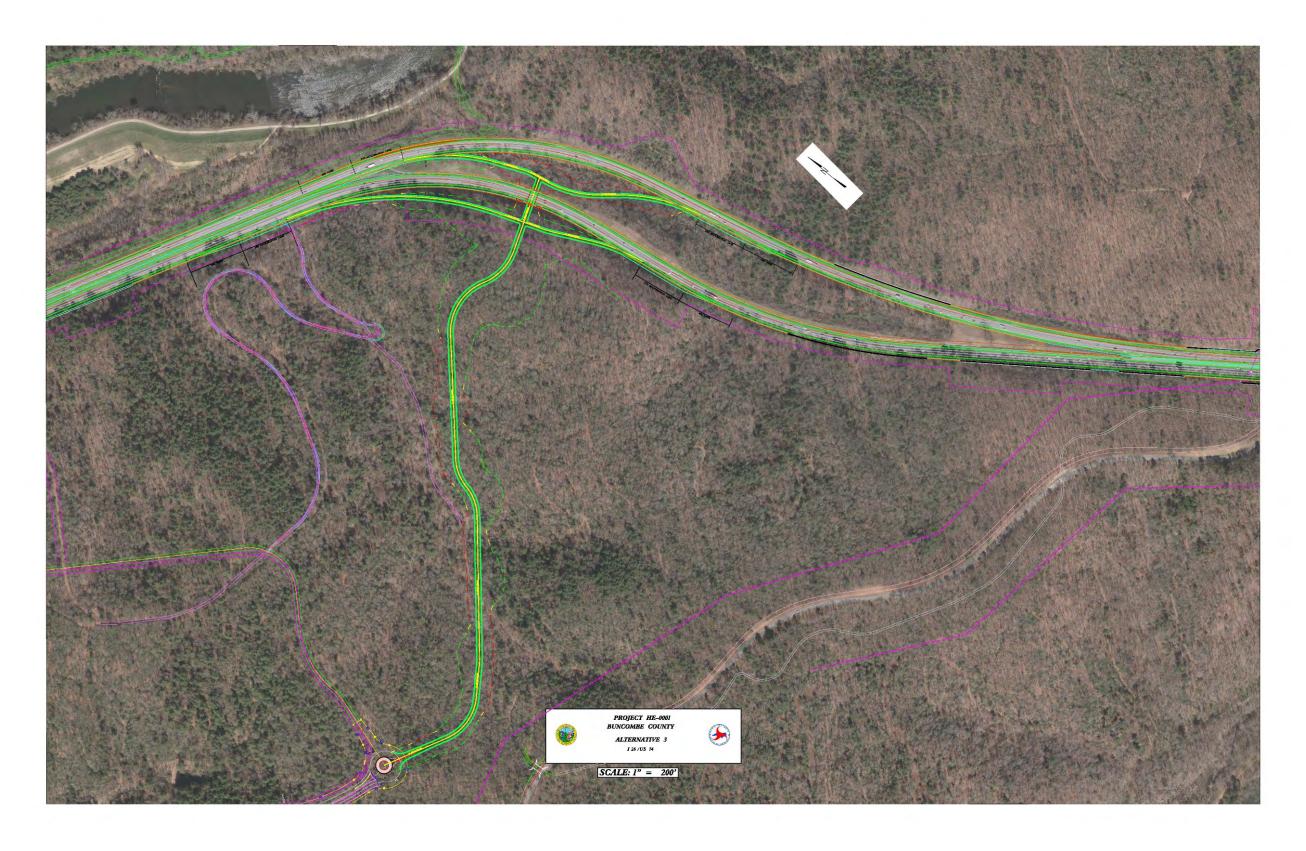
PROPOSED BUILD ALTERNATIVE 3
